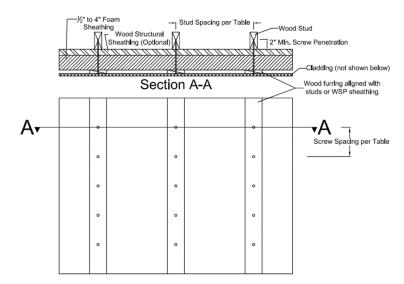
Elevation View of Wall Assembly with Vertically Oriented Wood Furring
